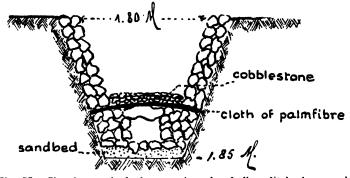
Showing method of conversion of a shallow ditch along road into a closed drain.
